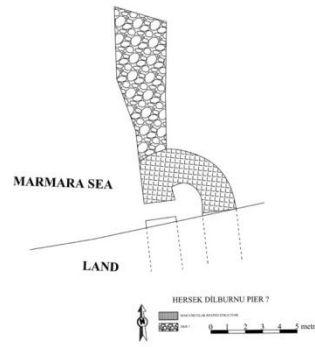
Plan of Pier and Semi-Circular Shaped Structure
